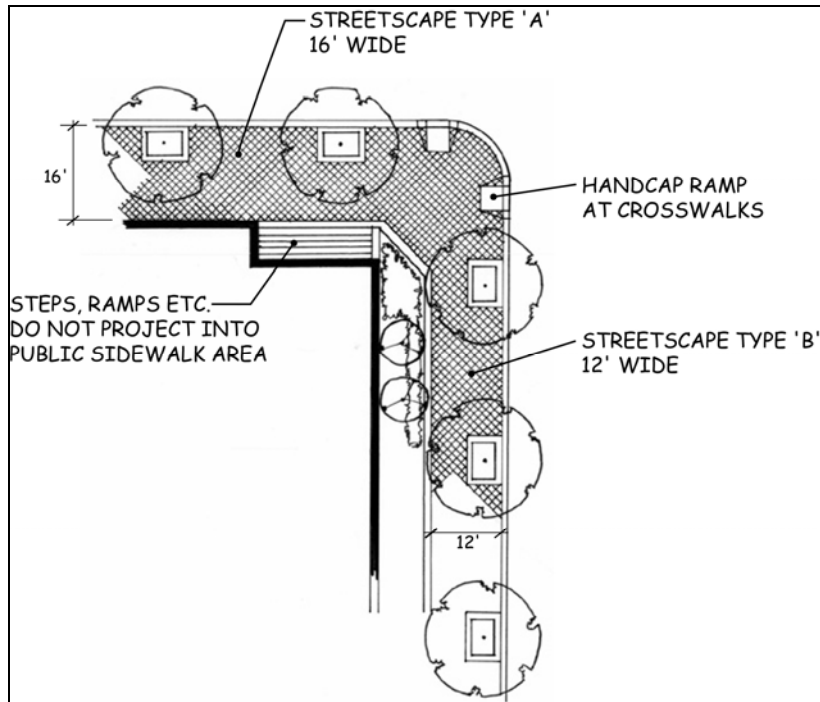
Corner Transition from One Streetscape Standard to Another
